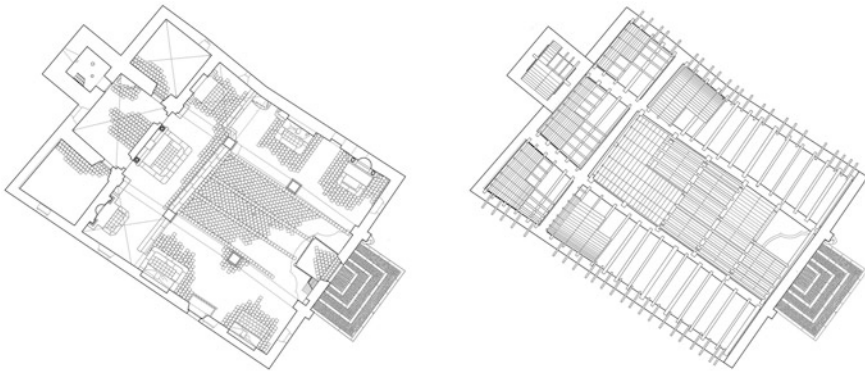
Floor and roof wooden structure (originally 1:50 scale)
